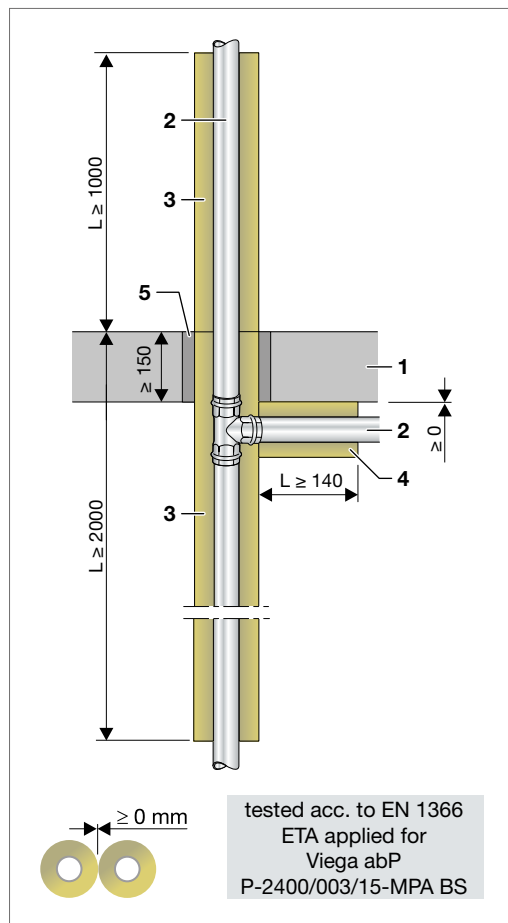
Storey connection with Viega piping systems – below the ceiling
